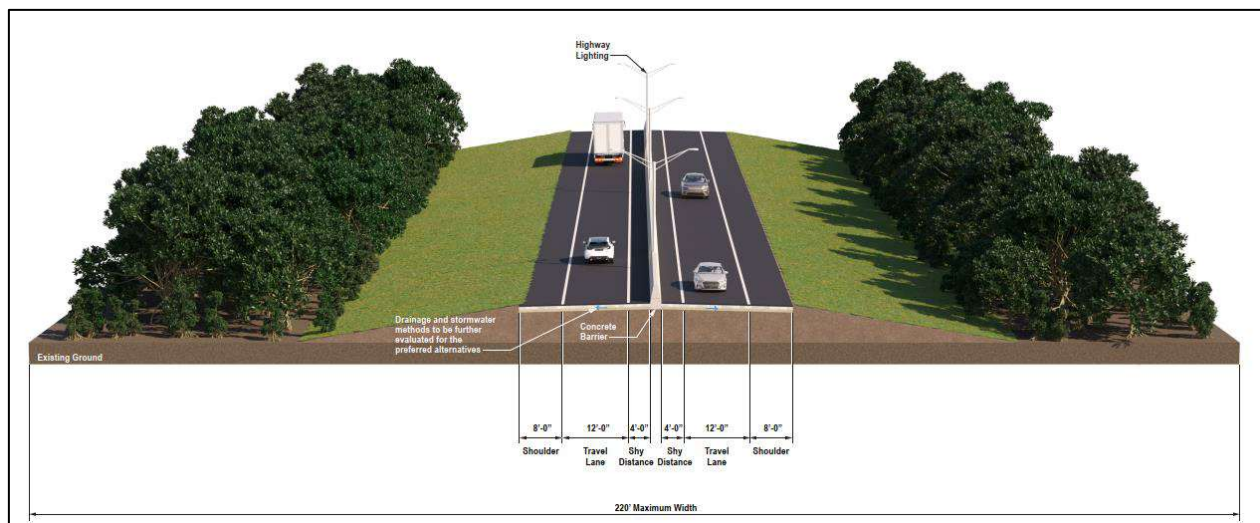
2026 Build Alternative Section 2 Cross-Section for All Alternatives and Section 3 Cross Section for B1, B2, and B3
